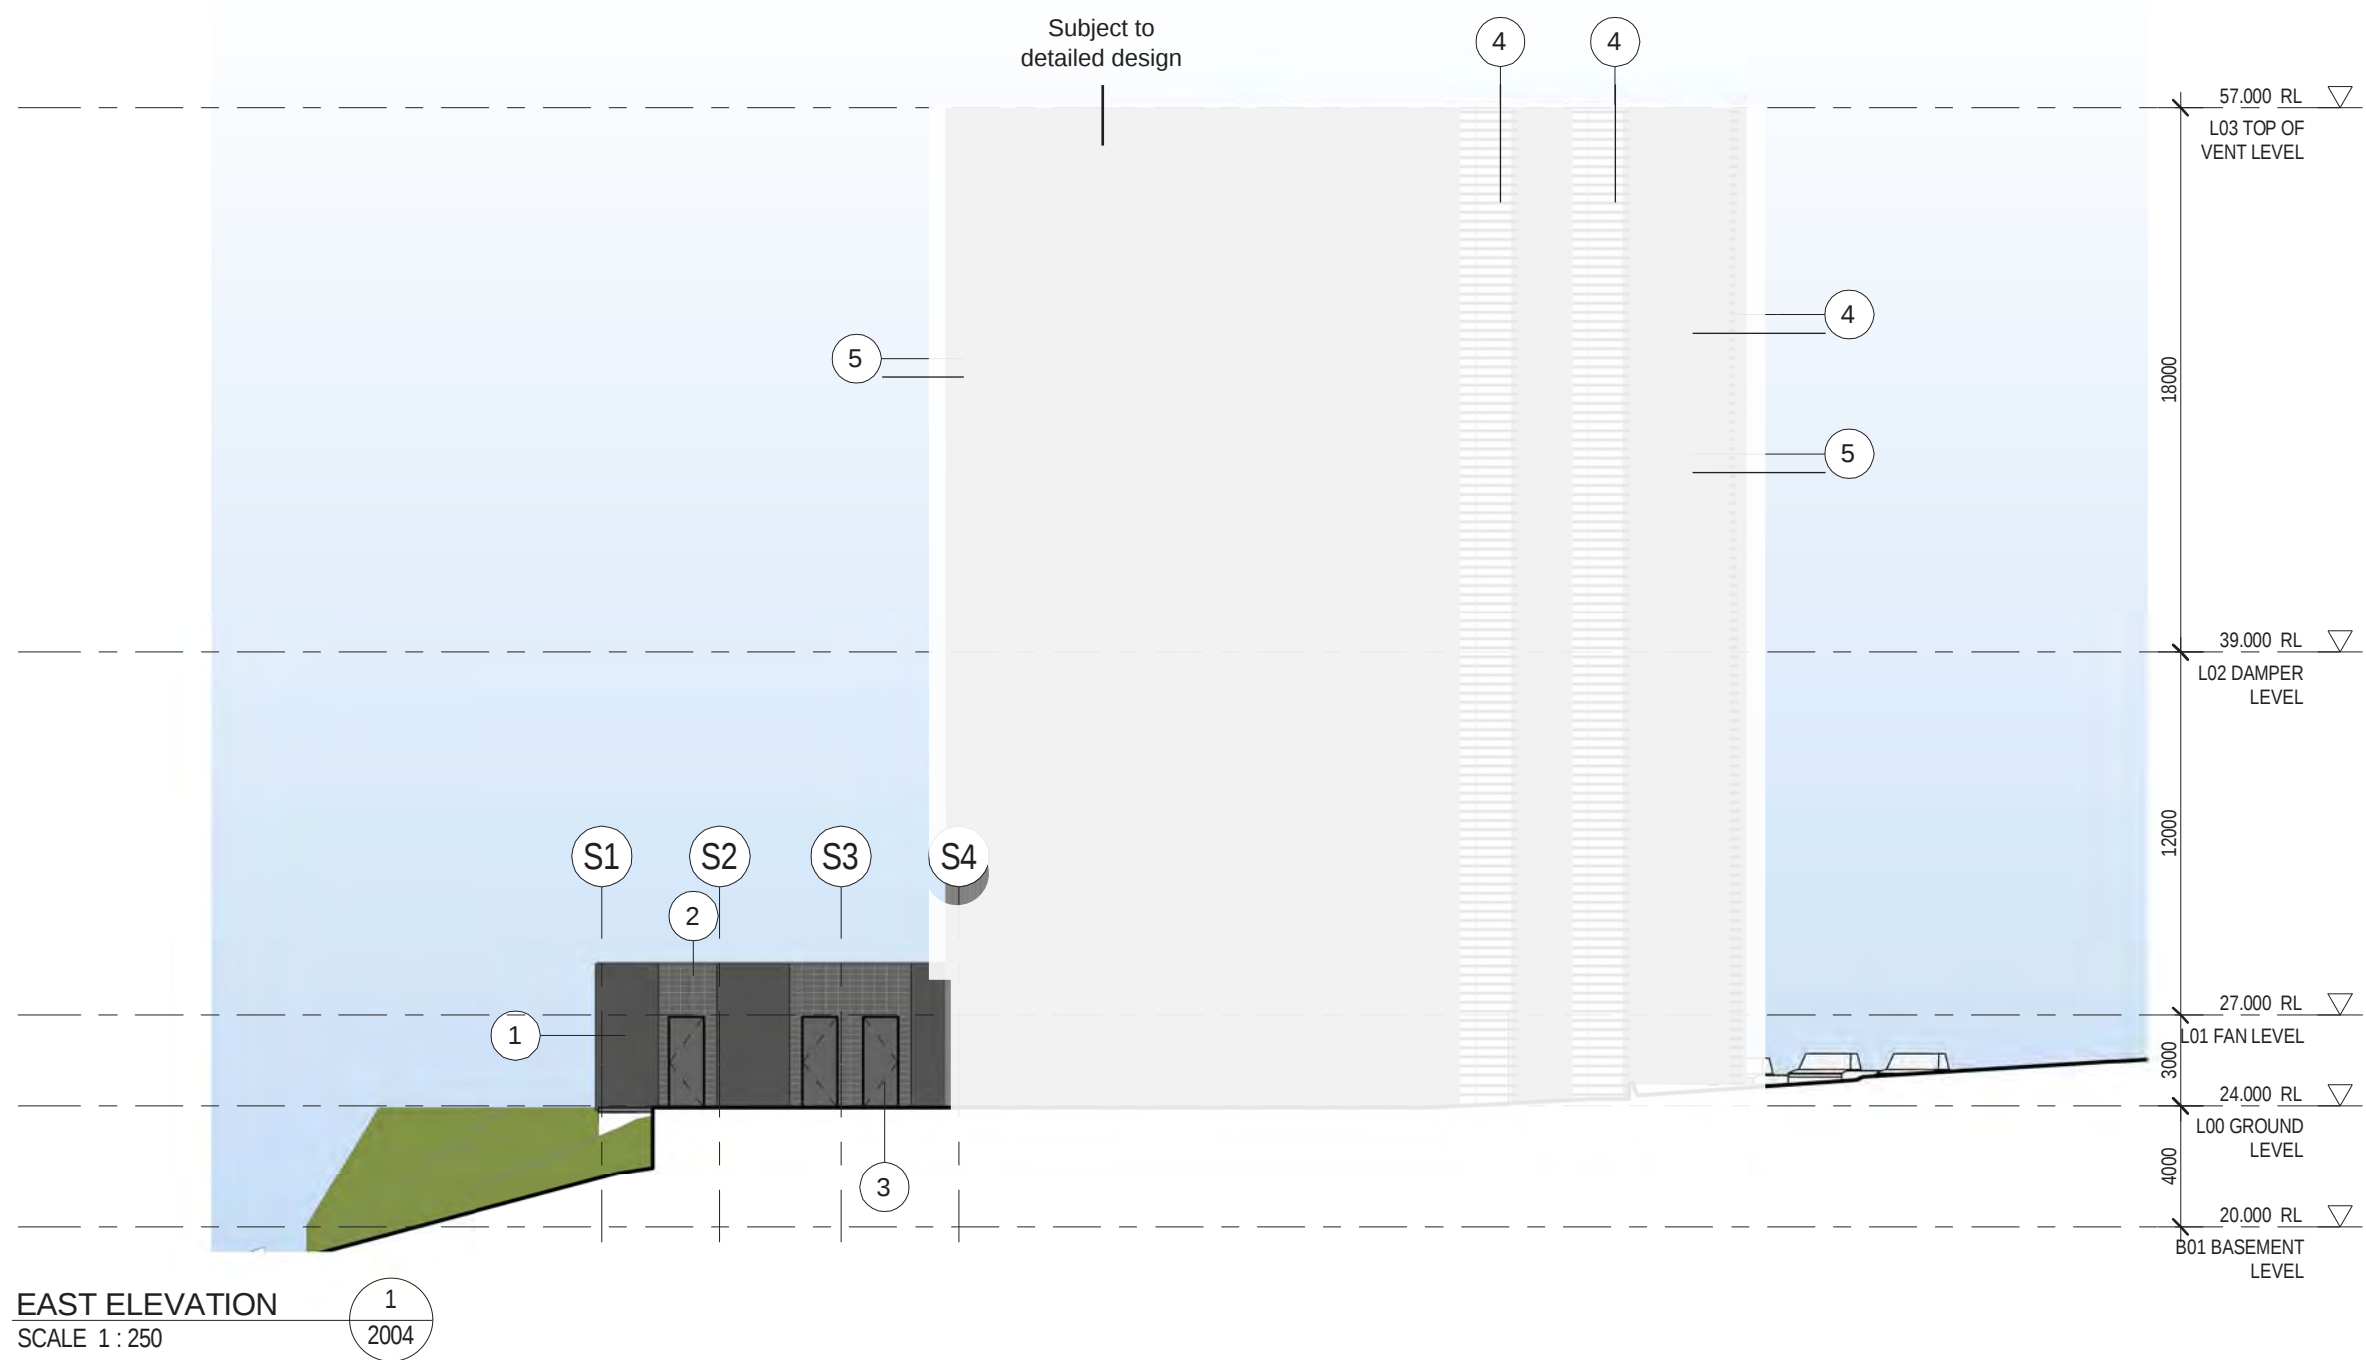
MOC1 facility at Kingsgrove indicative elevations
